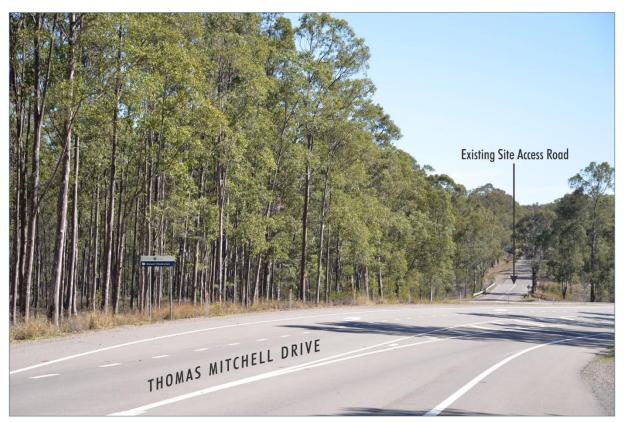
Existing Site Access Road from Thomas Mitchell Drive Source: VPA (2019).
